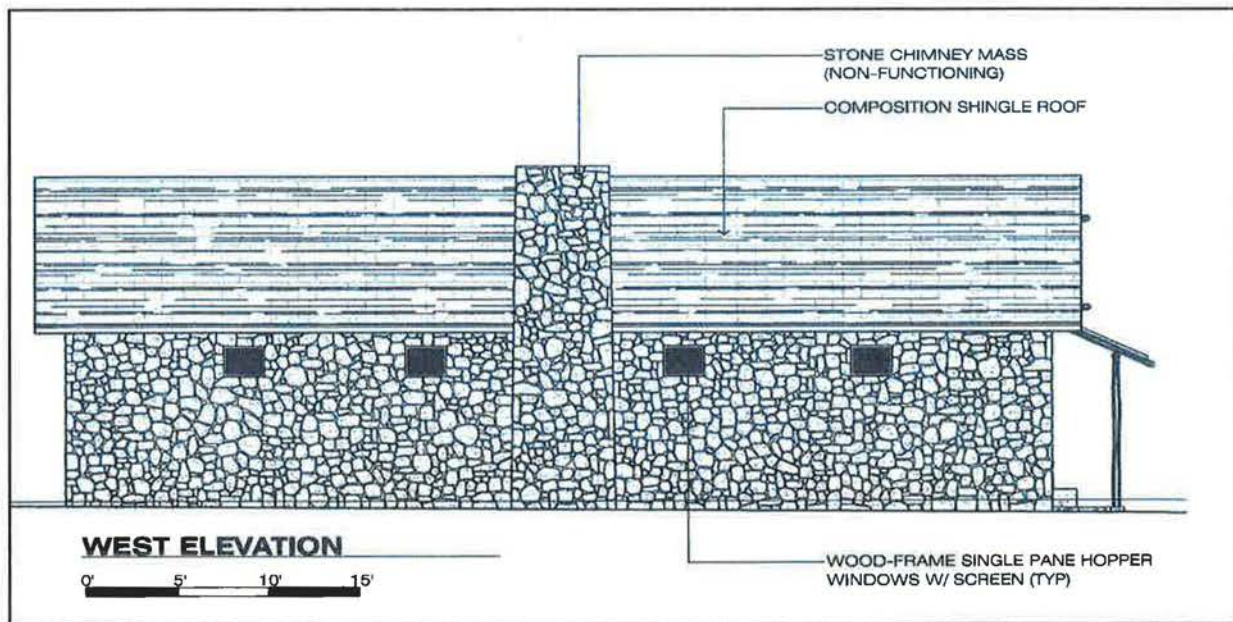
West-northwest elevation of Rock Schoolhouse at Beaver Creek School. From *Documentation of Existing Building: Rock Schoolhouse, Beaver Creek Elementary School*, KDAstudio, 2014.
